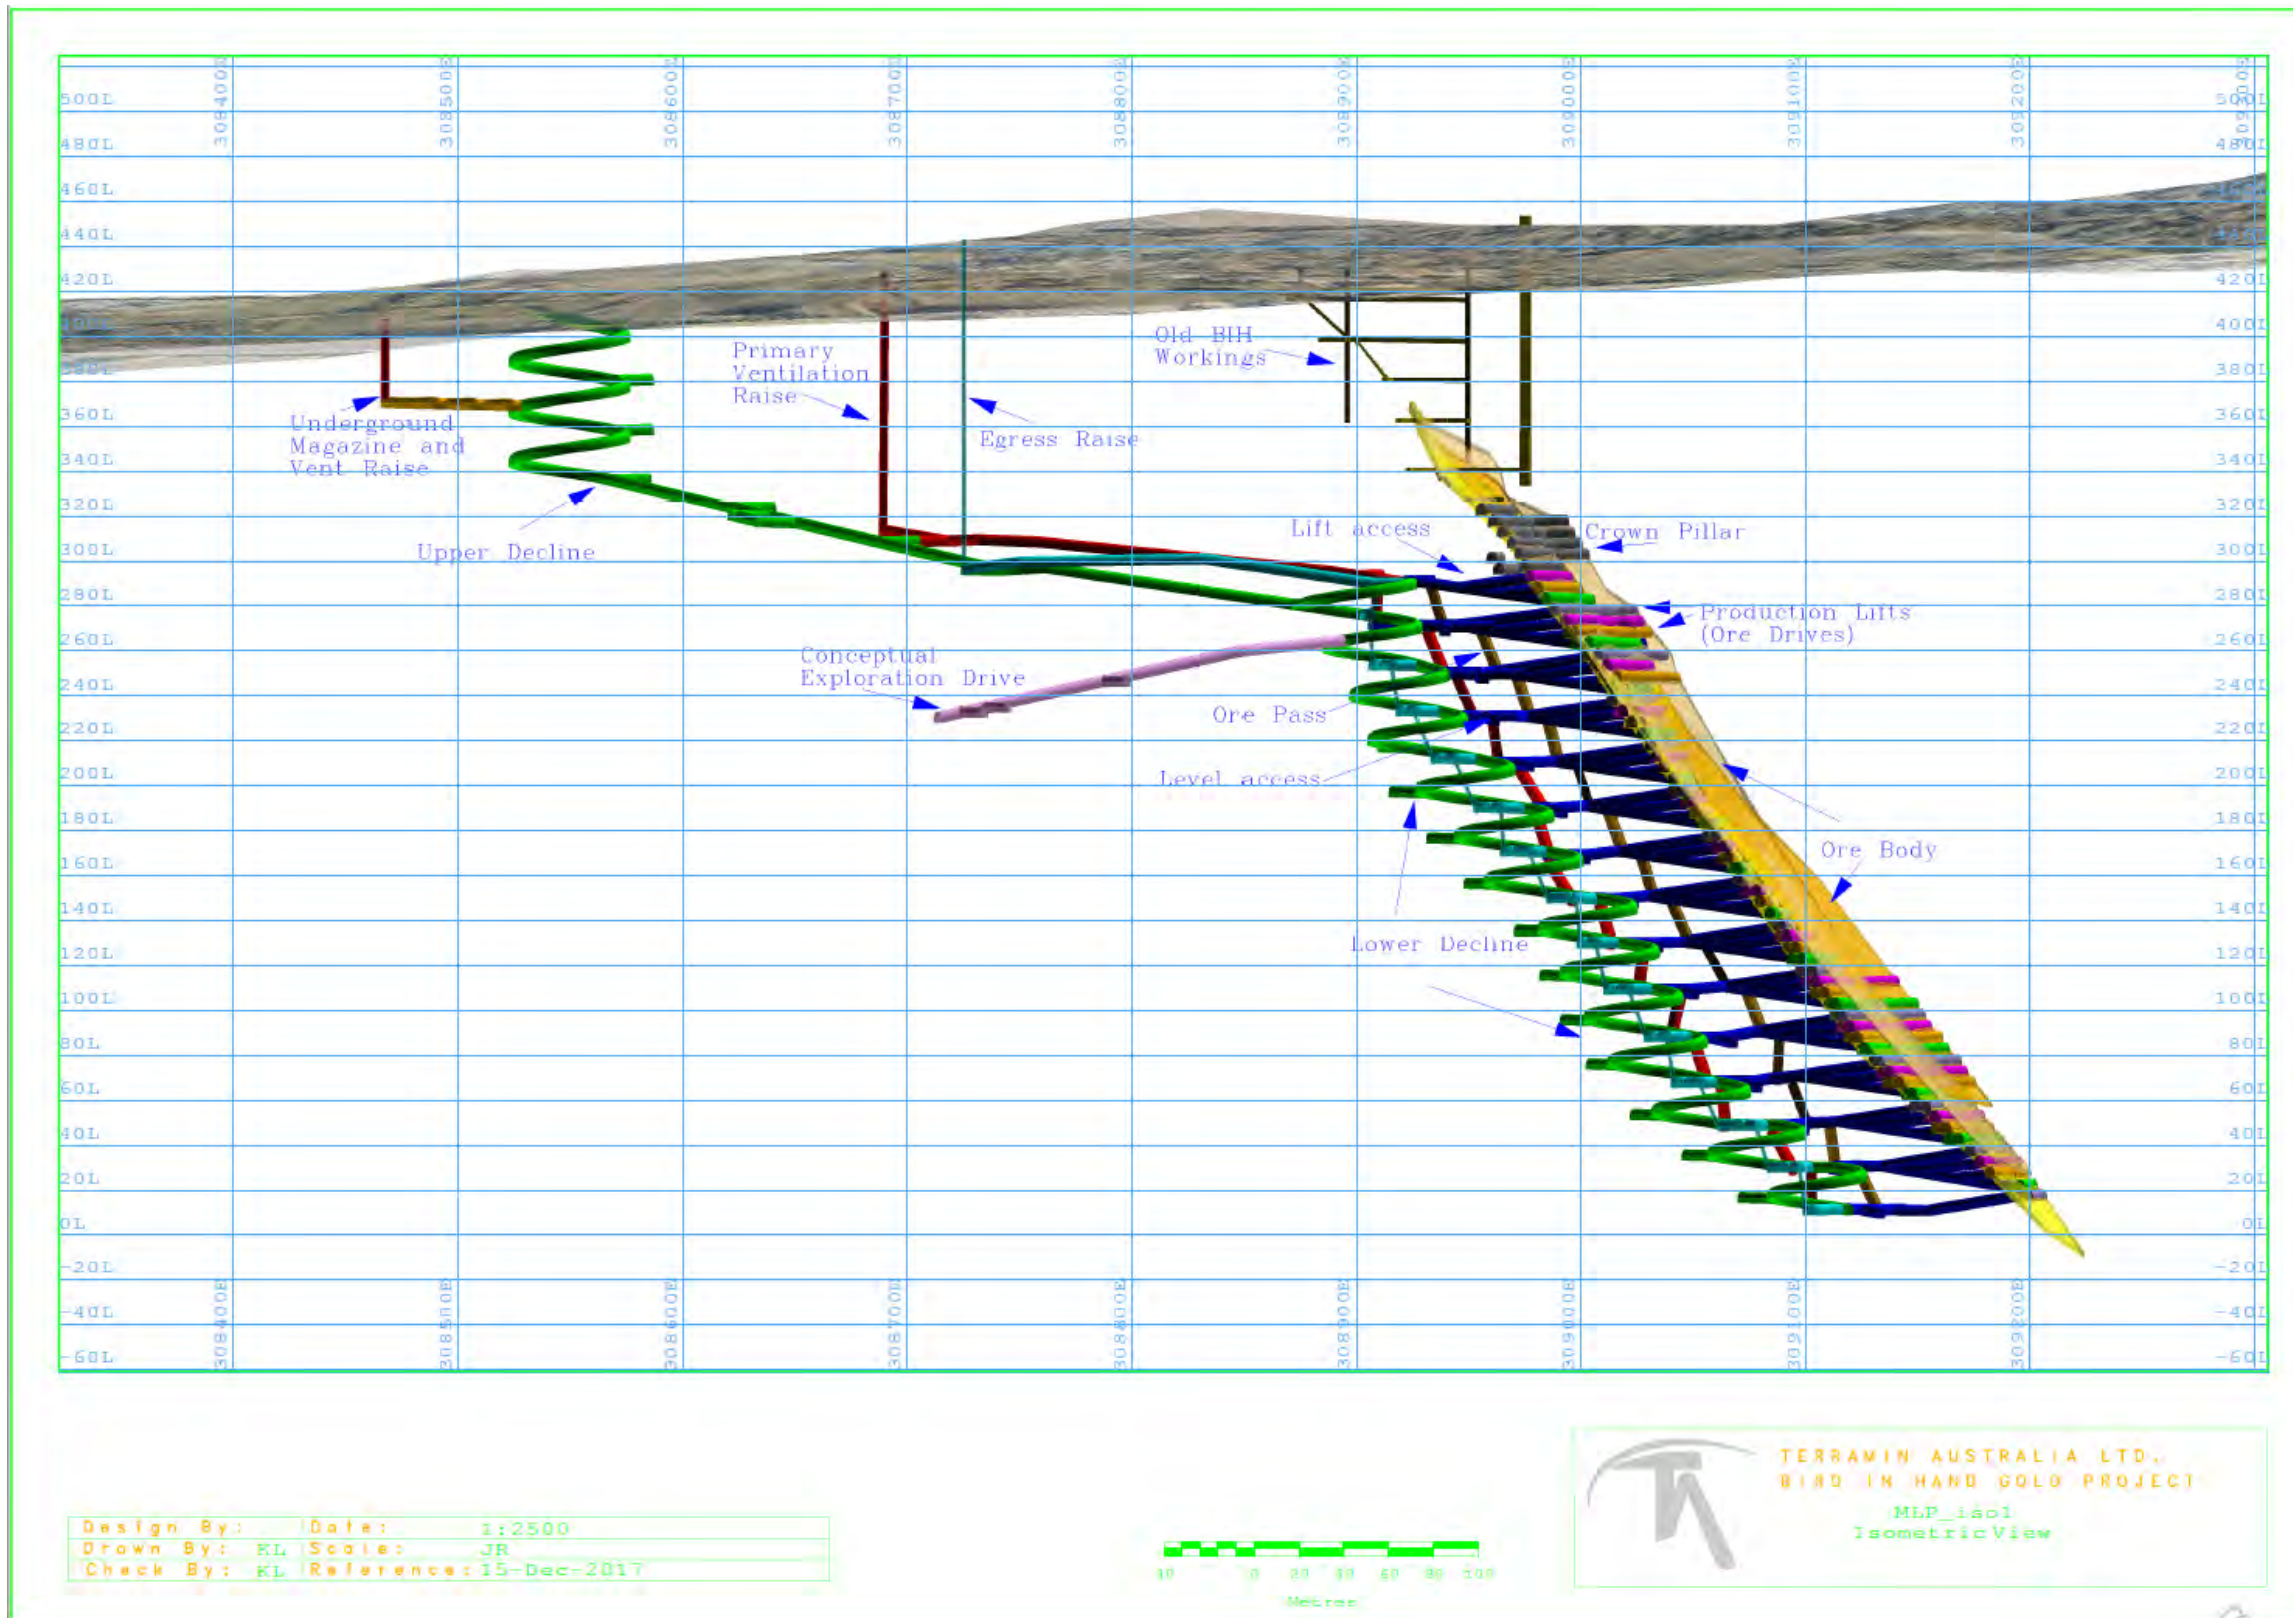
| ISOMETRIC VIEW OF UNDERGROUND WORKINGS LOOKING NORTH
